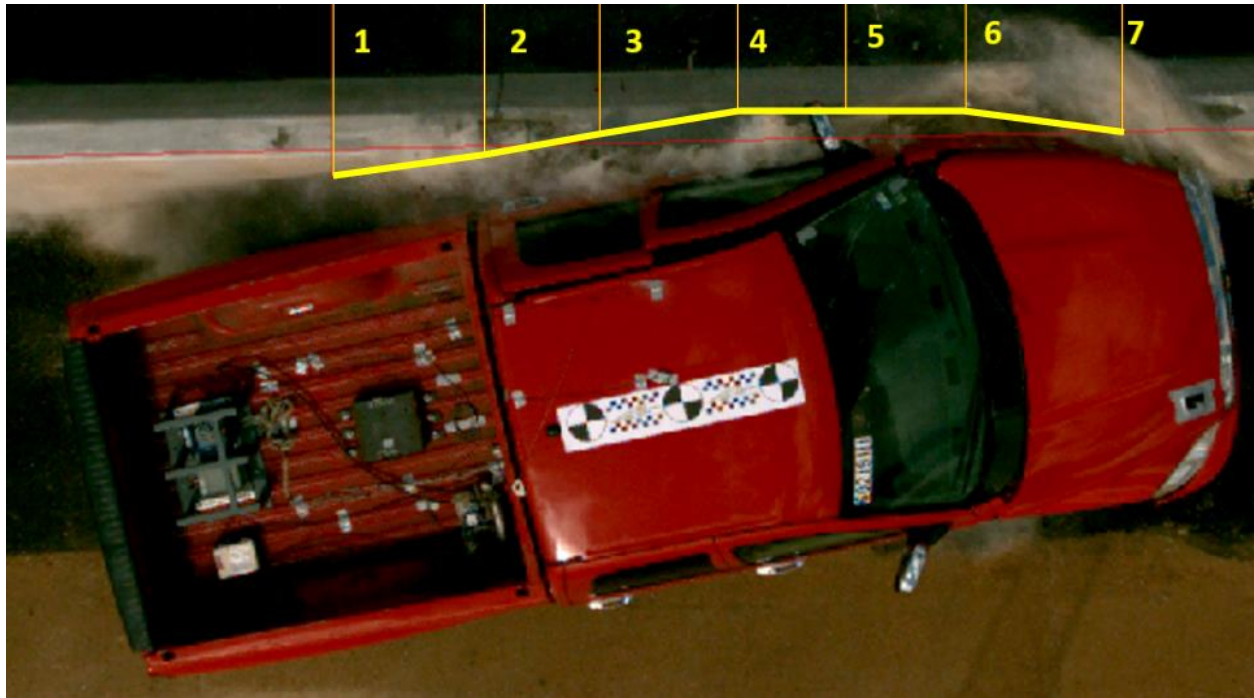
Sketch of Vehicle Extension (Front Driver Corner) over Barrier (TTI Test Number 602191-1)
